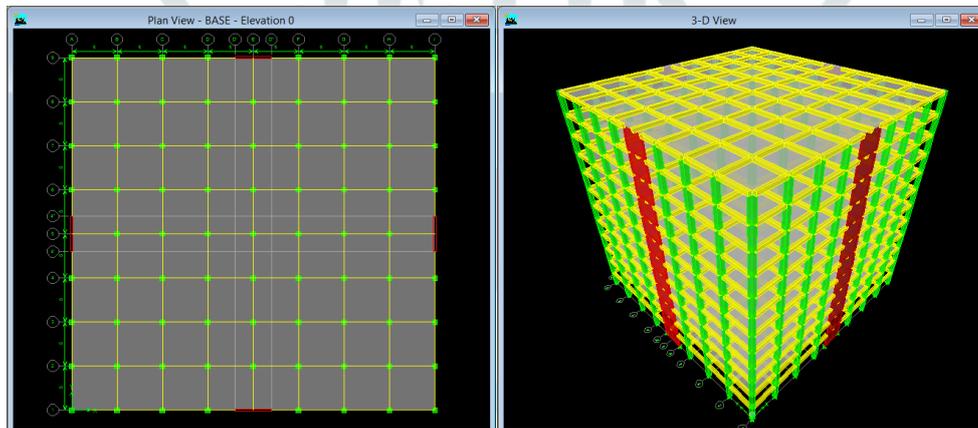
Plan and 3D view of building for R=1 (40m x 40m)
